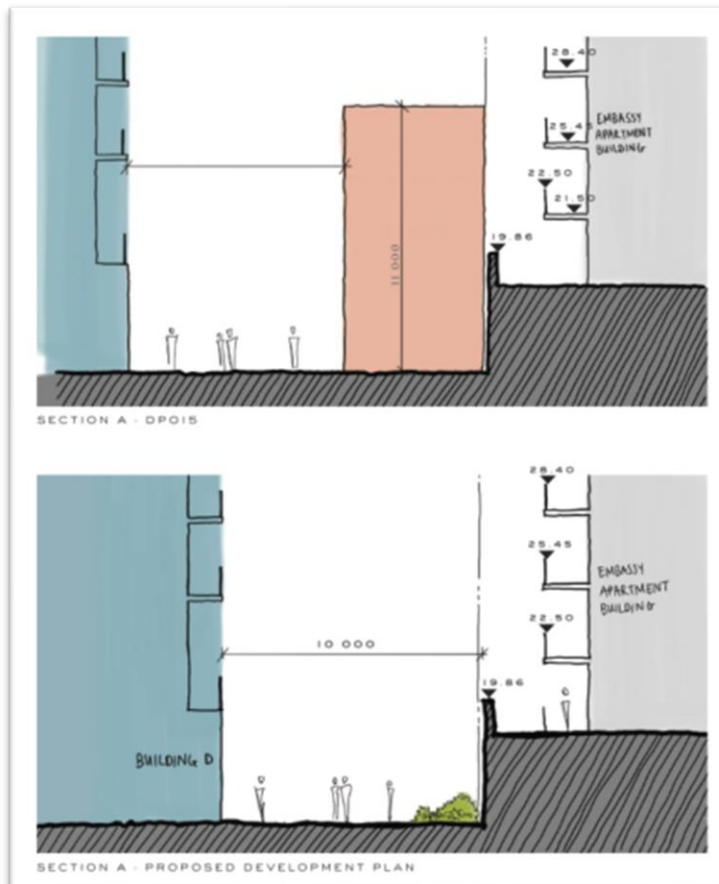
DPO built form requirement (above) and proposed DP outcome (below). Source: Development Plan (Gurner 2023)
